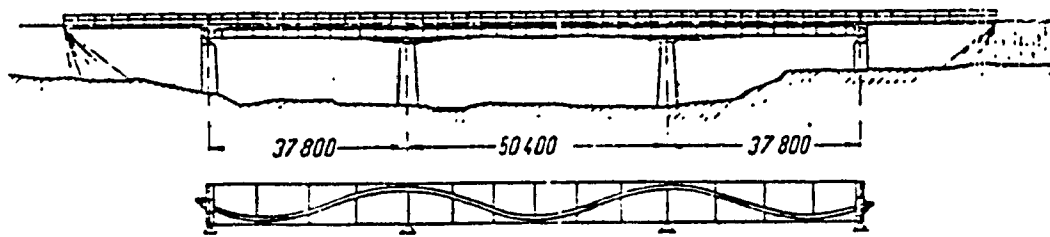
Elevation and tendon configuration of the bridge at Montabaur, W.G.
